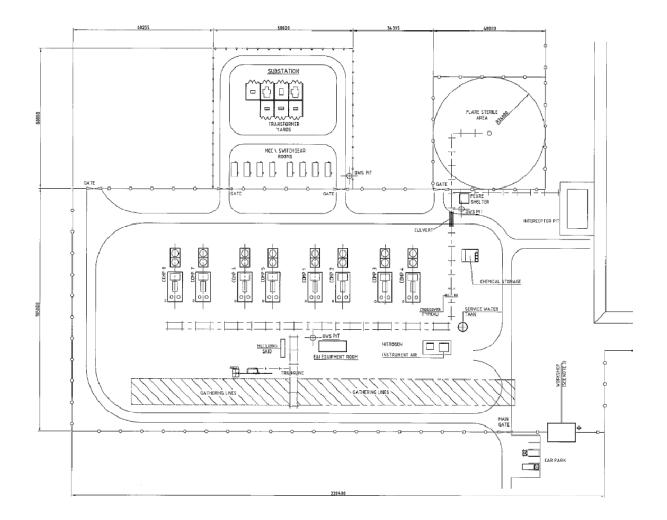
Example FCS layout (maximum number of compressors)
